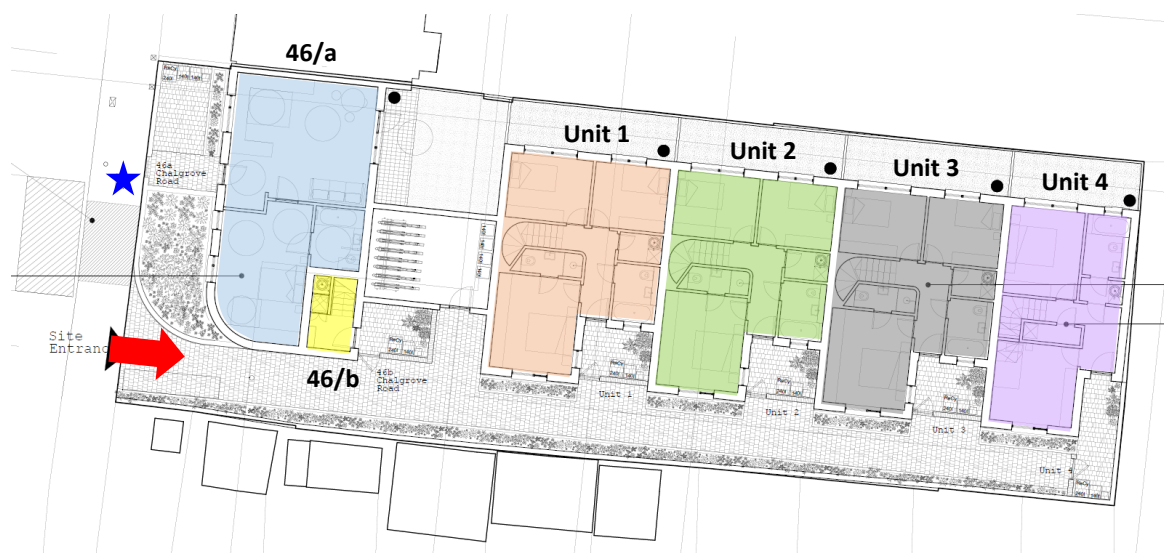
Proposed Ground Floor Plan, access route from Chalgrove Road and existing fire hydrant (blue star symbol)
